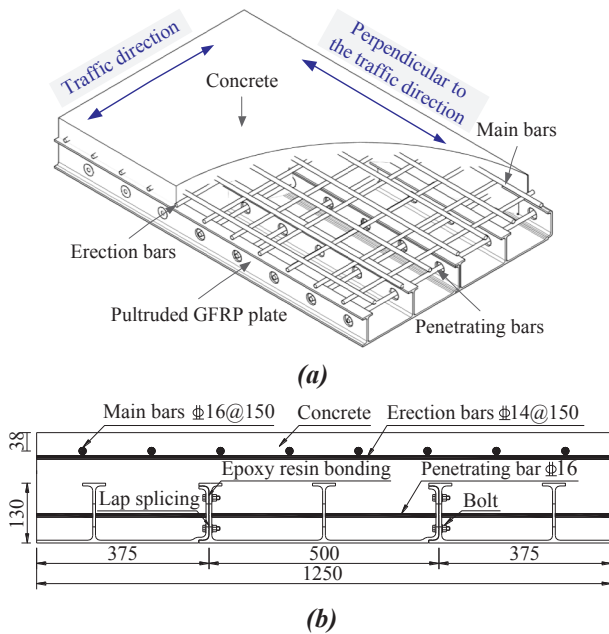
Proposed hybrid GFRP-concrete bridge deck (mm): (a) schematic view; (b) cross-sectional dimensions.
